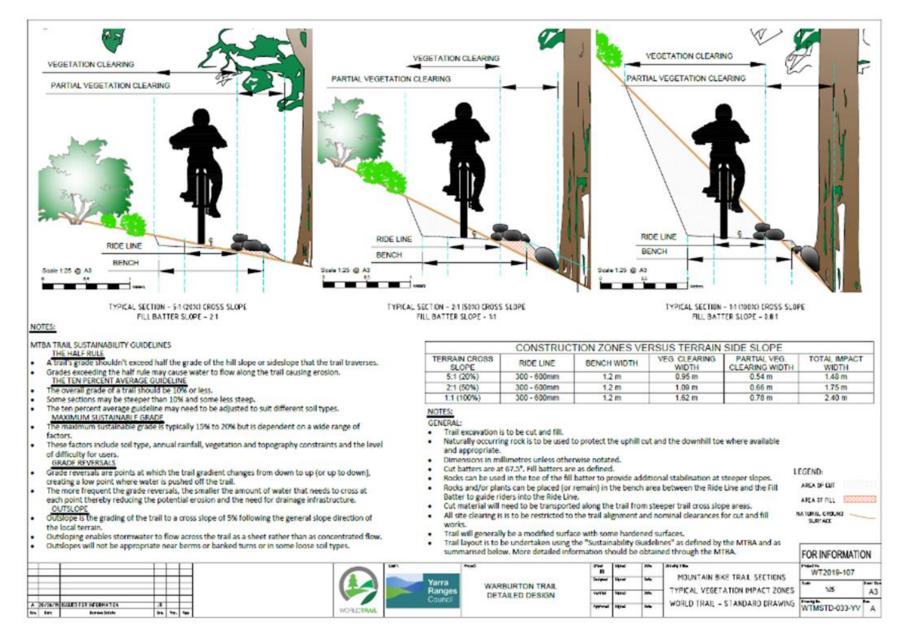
Indicative cross sections for standard benched trails Source: Word Trail
